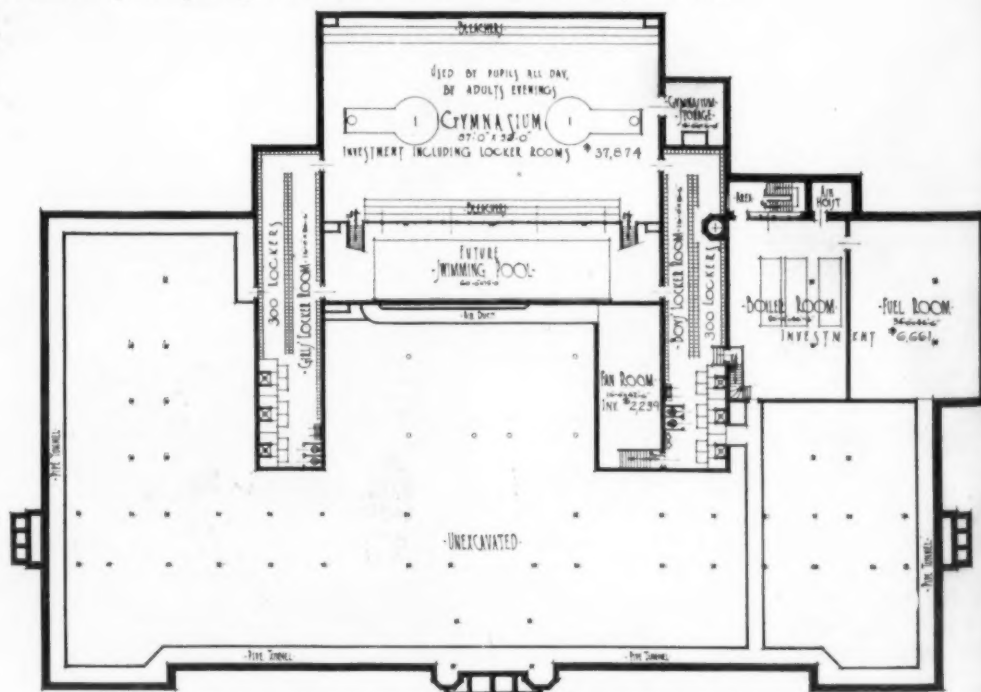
BASEMENT PLAN, PIPESTONE, MINN., SCHOOL.
